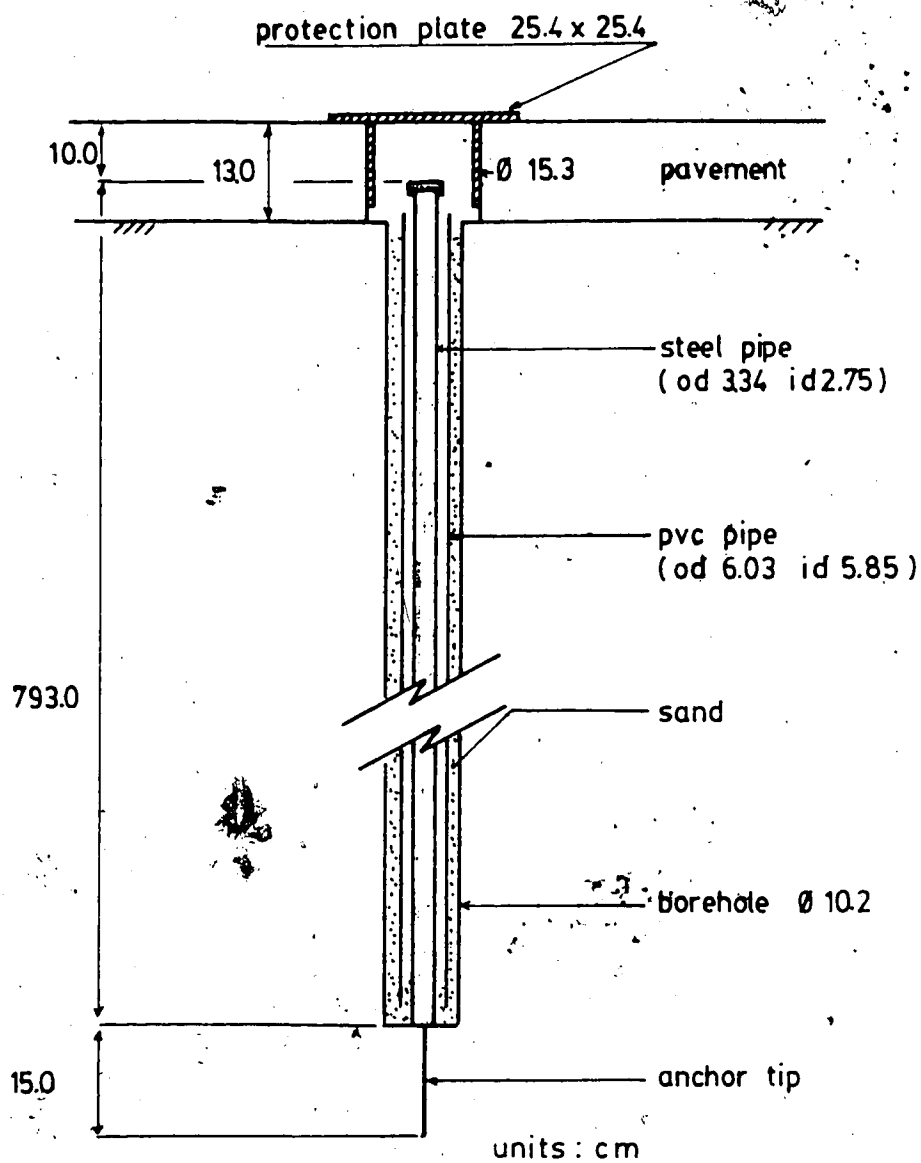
BENCH MARK BM1 - DESIGN DETAILS
